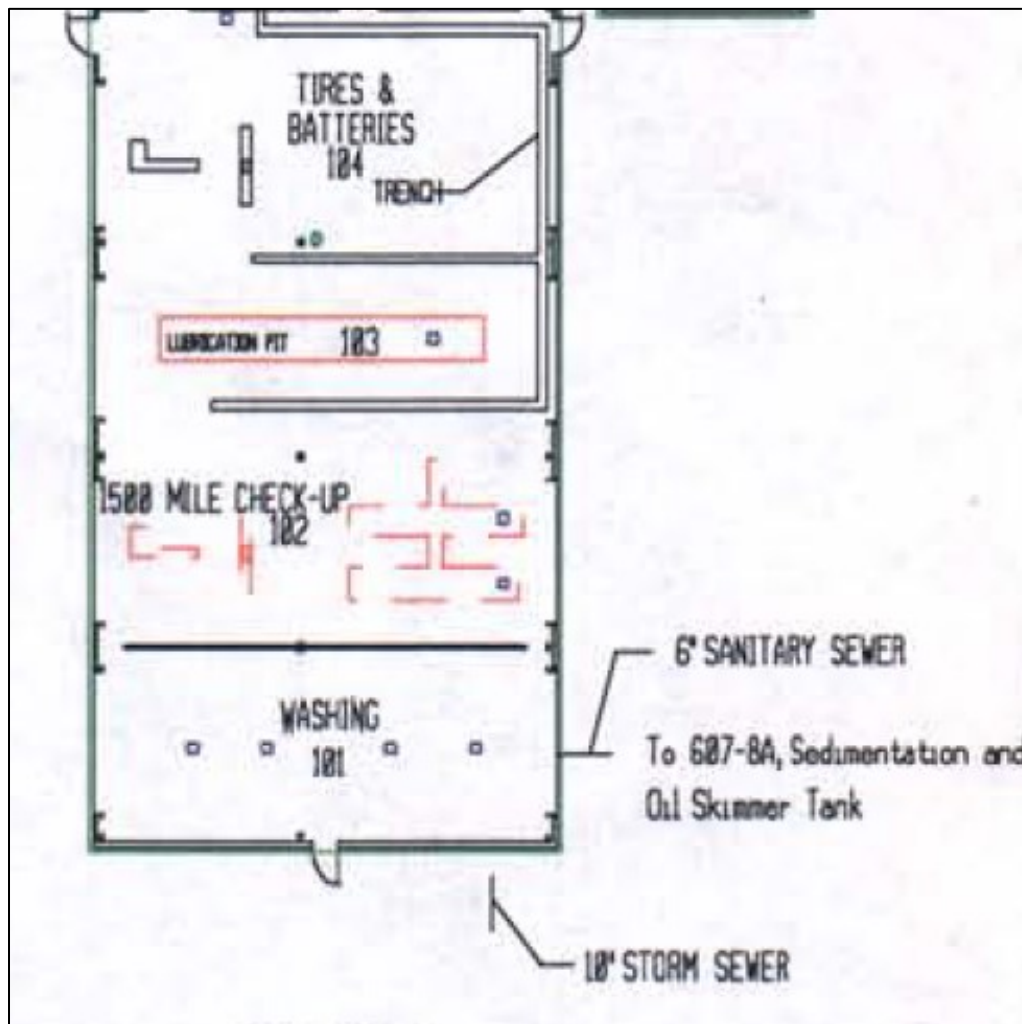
Location of 103 Lubrication Pit within the South End Floor Plan of Building 716-A
